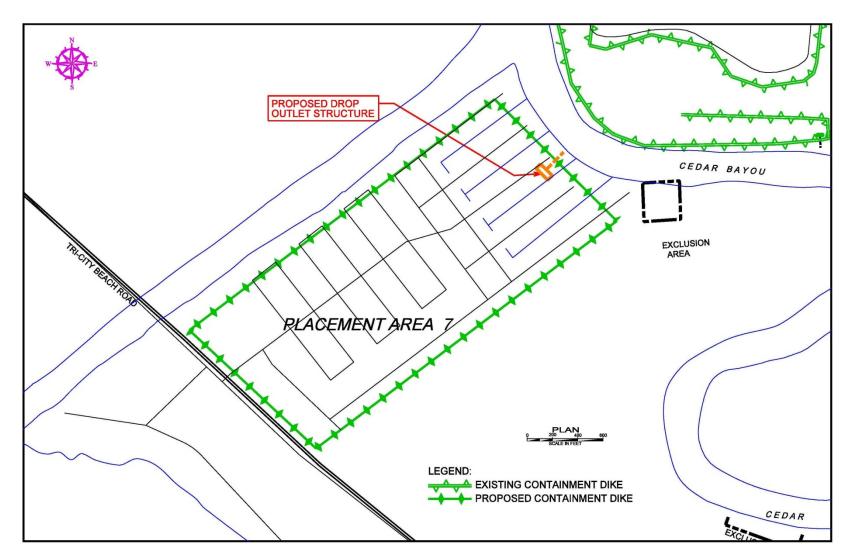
PA 7 Plan View (Component of Tentatively Selected Plan)
